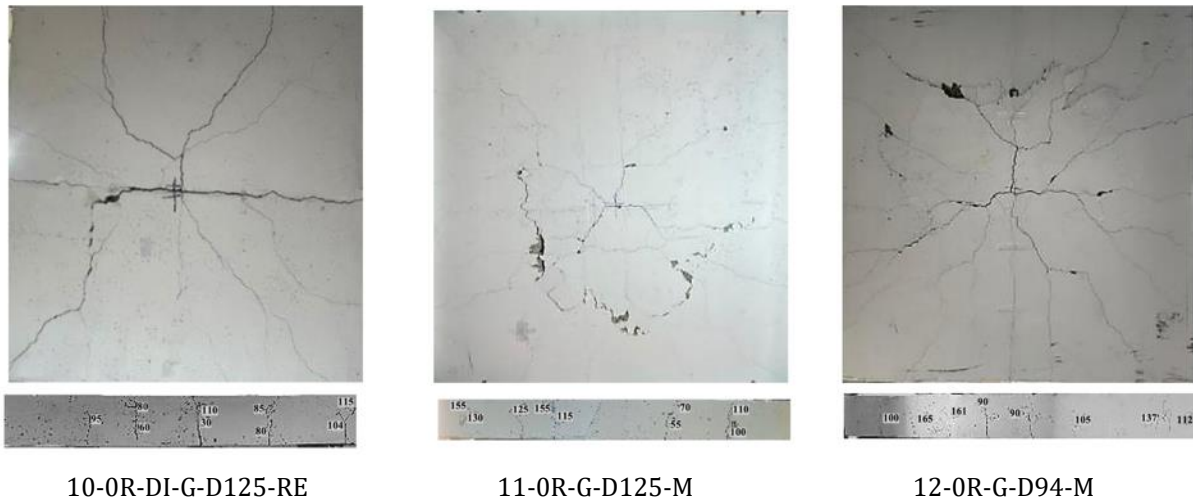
Failure modes and crack patterns of voided slab specimens at the ultimate stage
